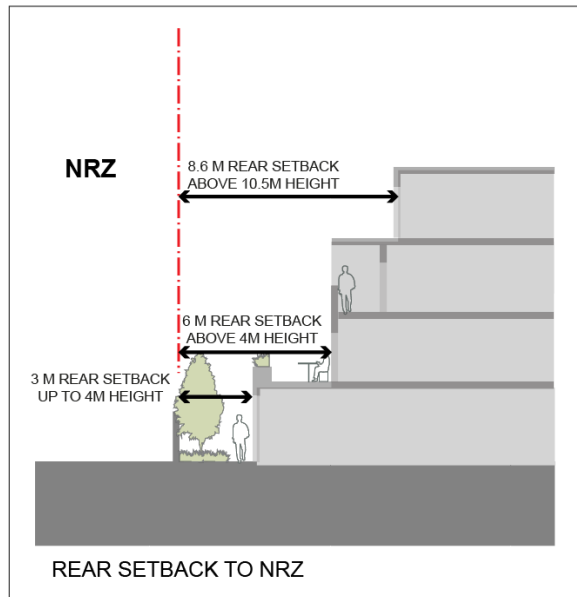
Rear building setbacks for sites adjacent to the Neighbourhood Residential Zone
